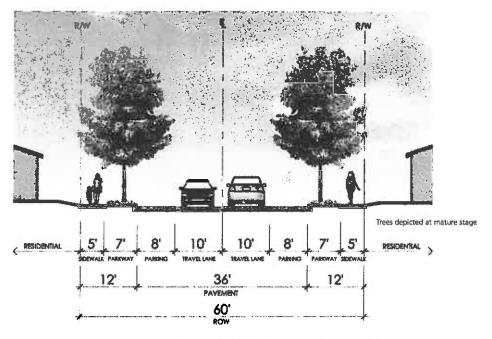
TYPICAL LOCAL ROADWAYS
